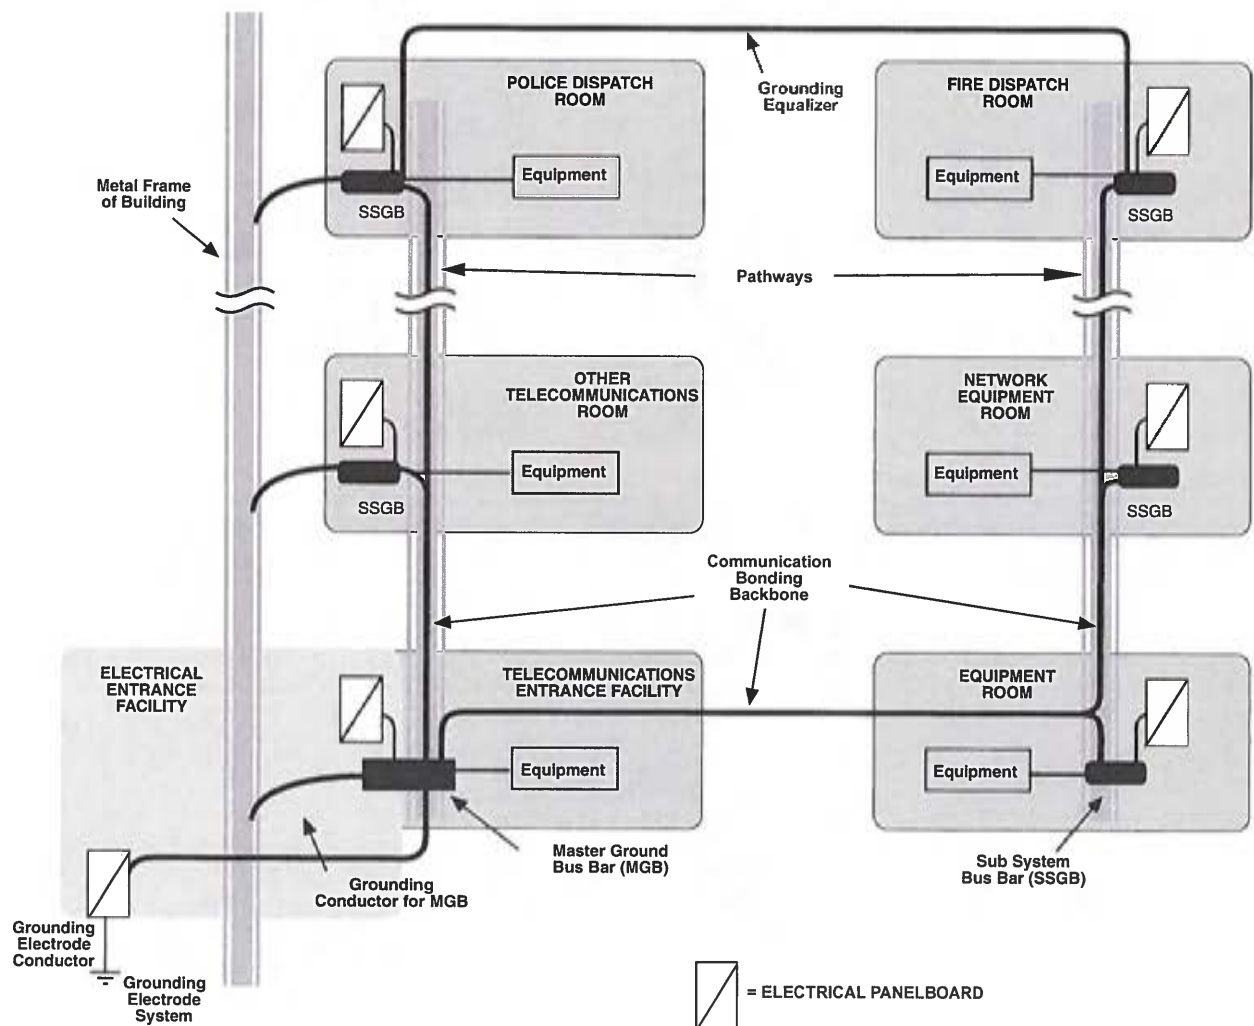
MULTI-STORY BUILDING WITH COMMON ENTRY LOCATION
